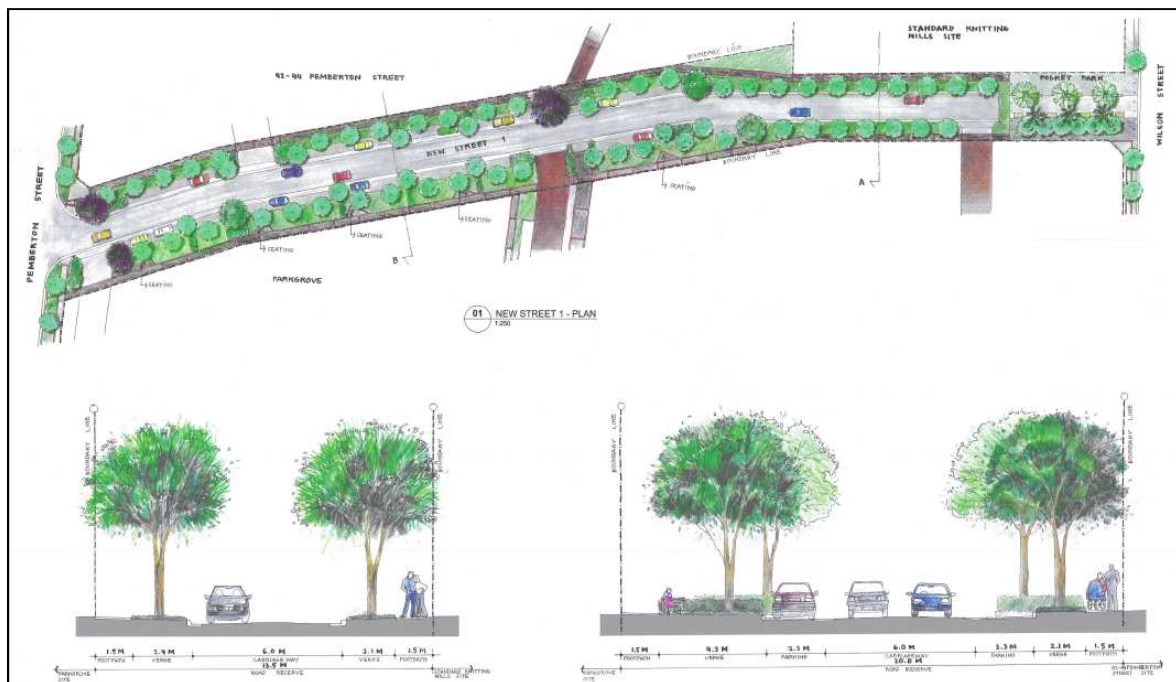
Proposed Streetscape as recently amended (source: Krikis Tayler Architects)
